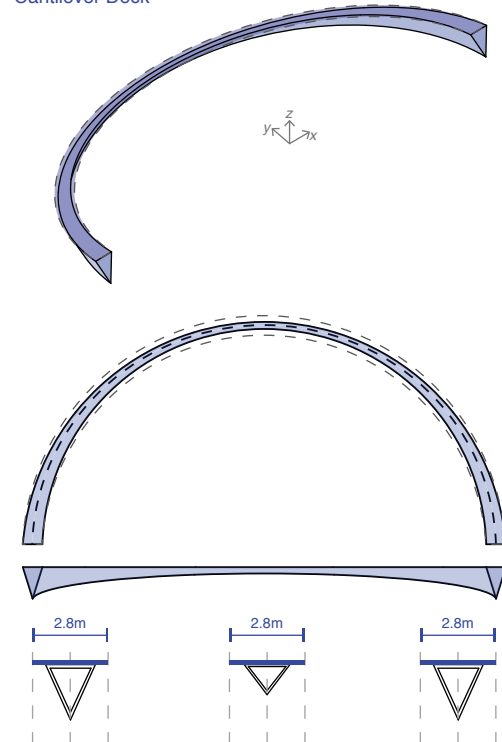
Fixed-width deck (2.8m) versus Cantilevering Sections.
